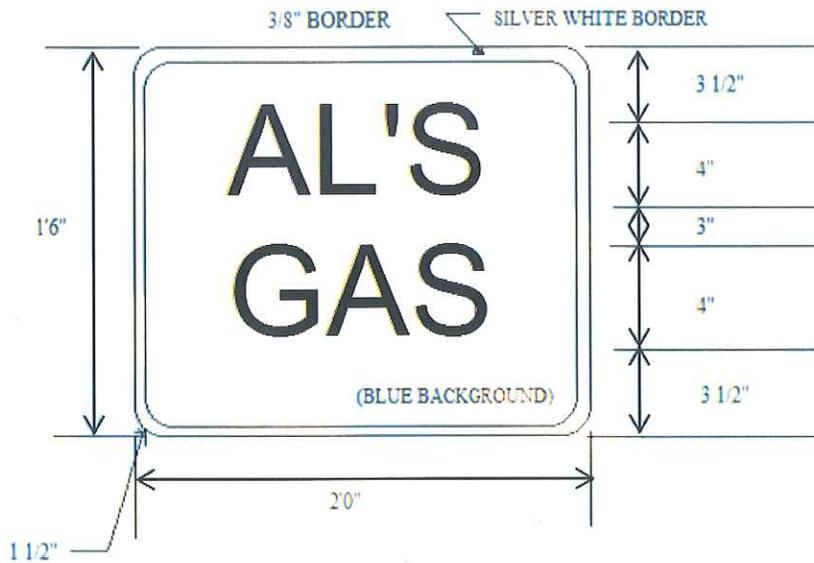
TYPICAL EXIT RAMP LOGO SIGN DETAIL
